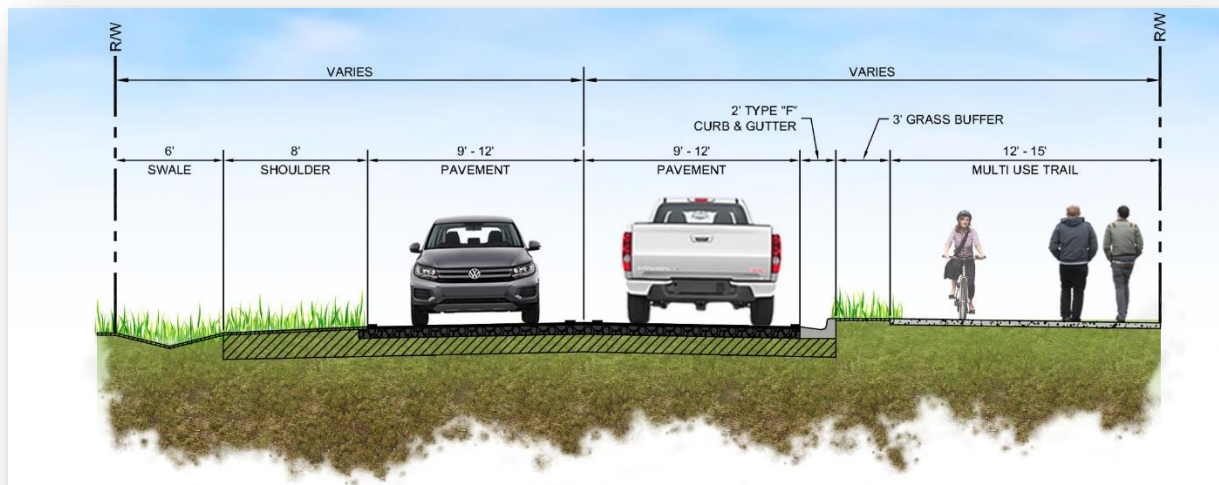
Multi Lane Road with Multi-Use Trail and Sidewalk
